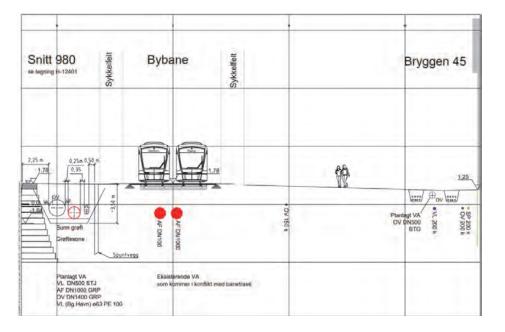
Planned pile wall at Bryggen (Bryggen 45)© Bergen commune
